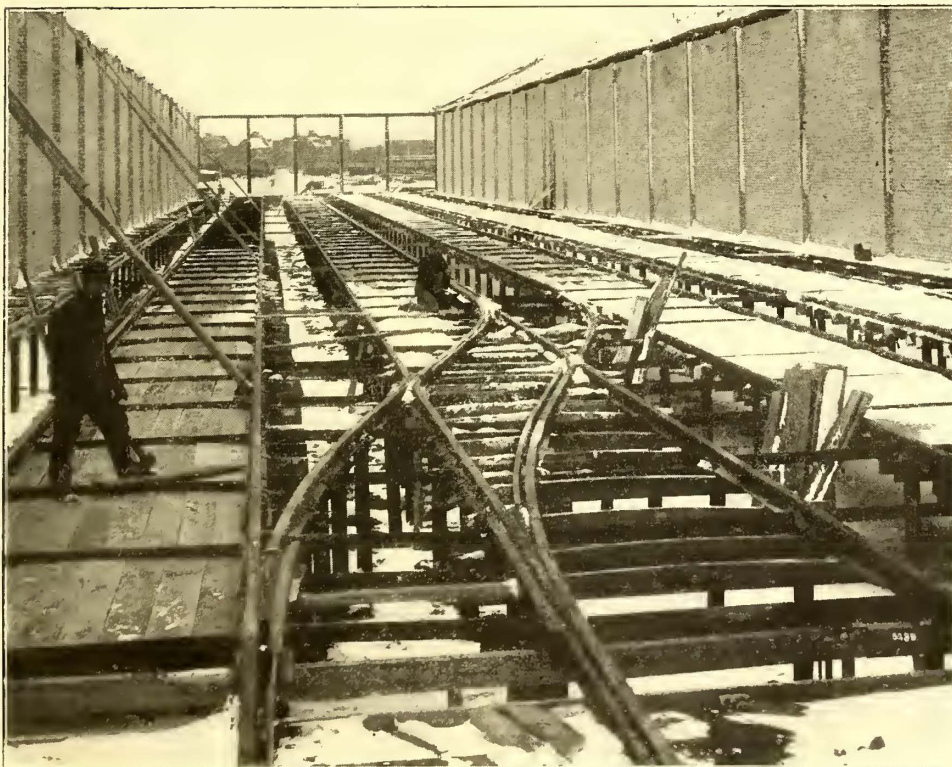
GETTING READY TO LAY CONCRETE FLOOR
